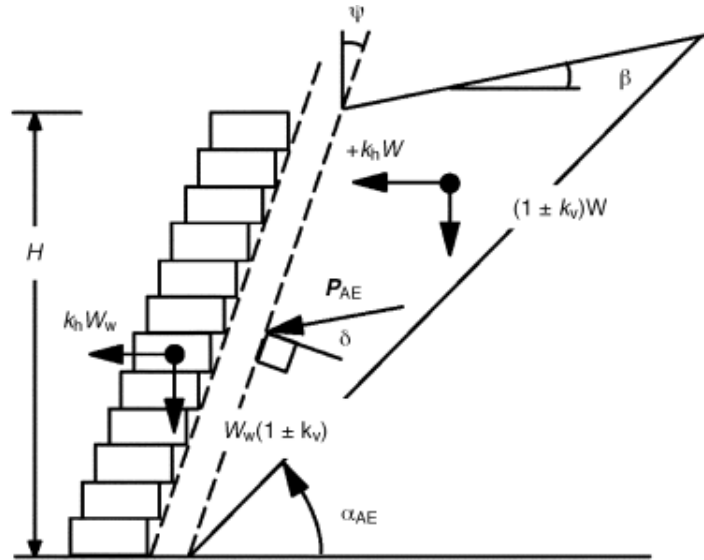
Forces in Pseudo Static Analysis of Segmental Retaining Walls
